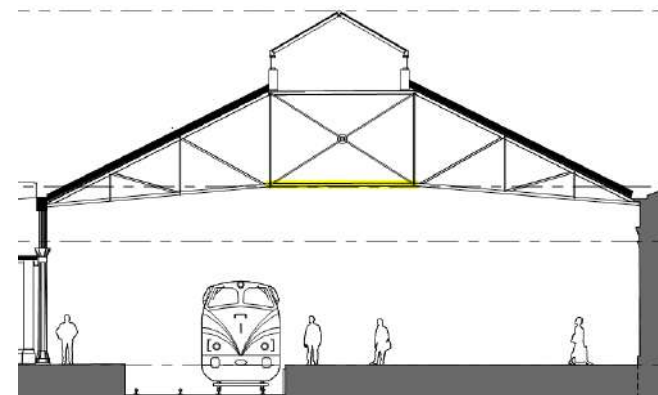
Strengthening detail to bottom boom of 6No. trusses at Manchester end of Roof A
